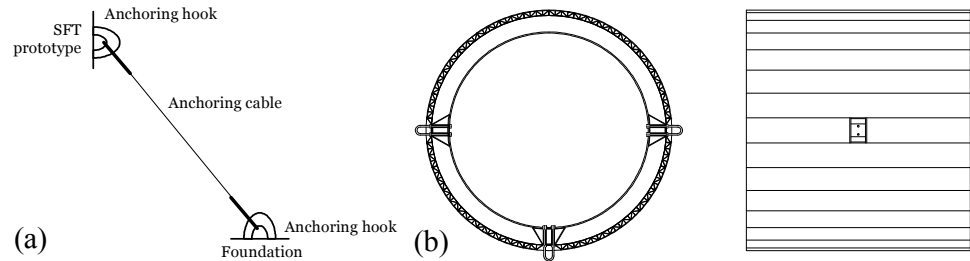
(a) Scheme of the anchoring system; (b) Cross-section where the anchoring connection devices are located
